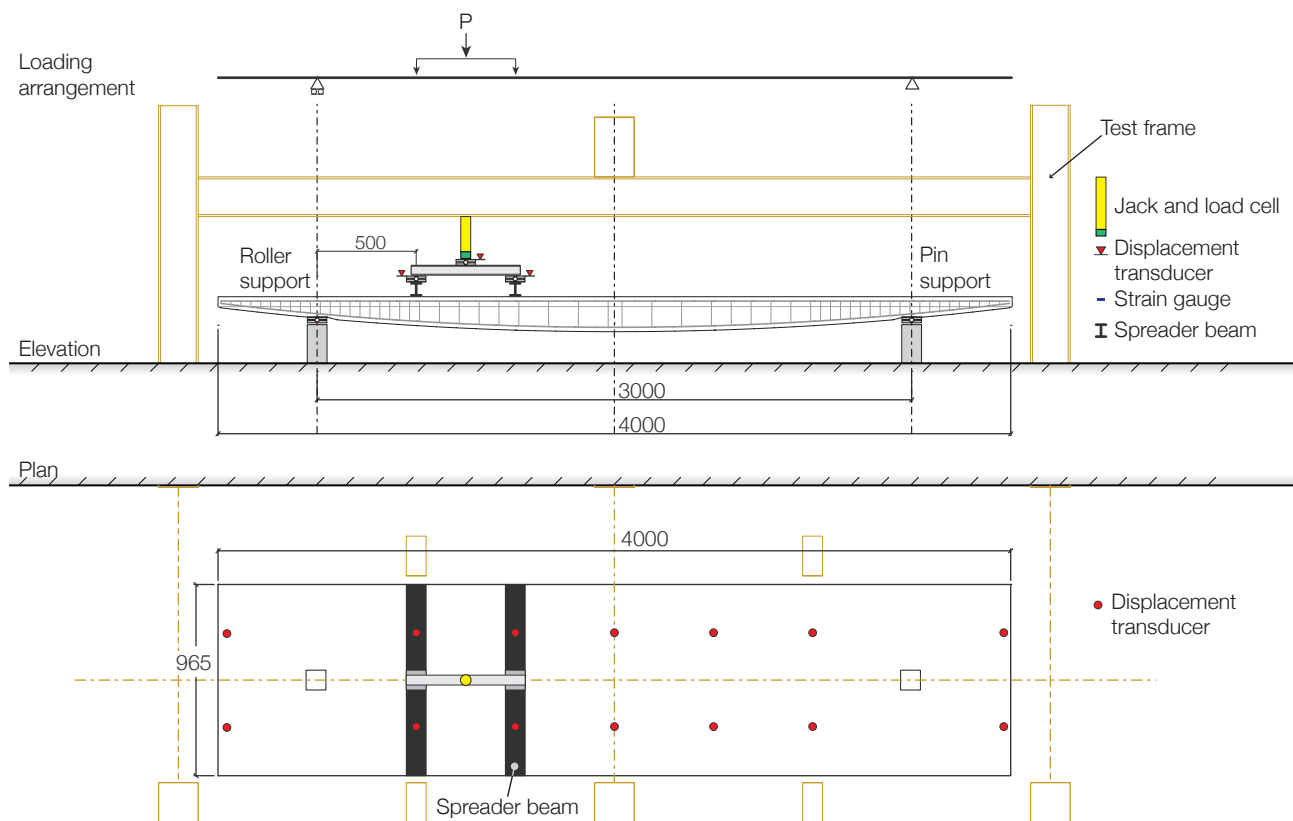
Testing arrangement for Beam 6\_4\_2(ii).
